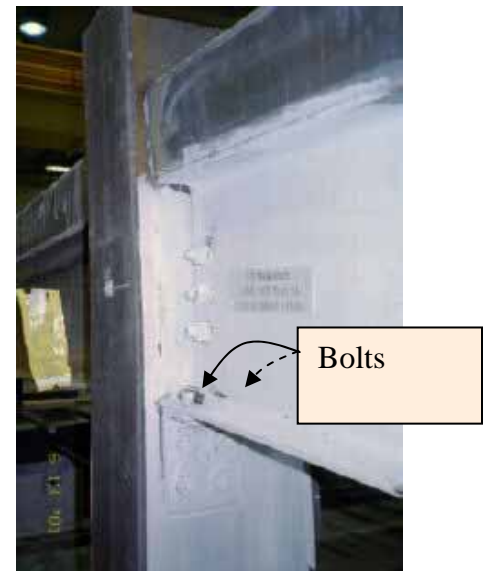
Failure of Bolts on Bottom Flange
